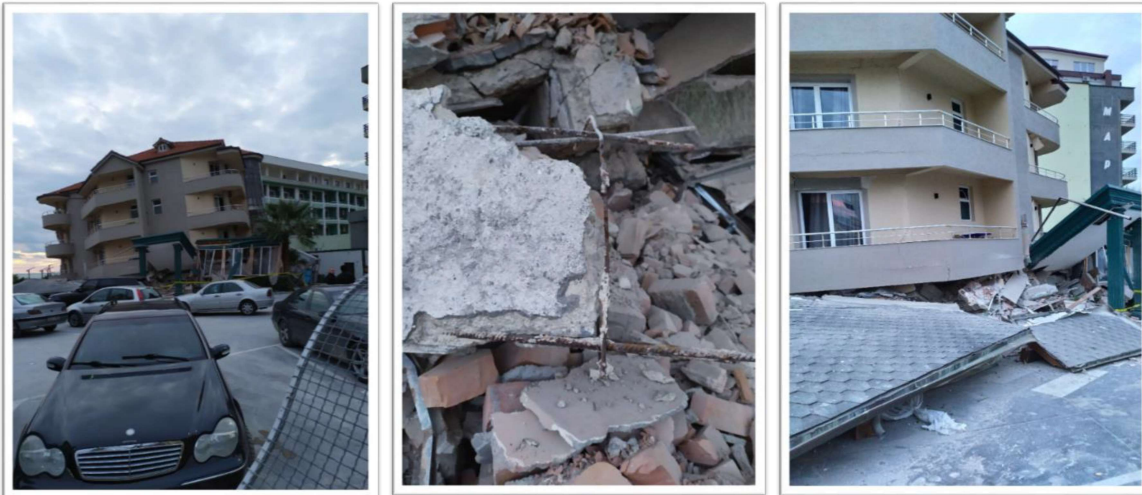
Damages in Buildings with RC frame and infill walls with more than 5 storeys (Vila Verde, Durres)
